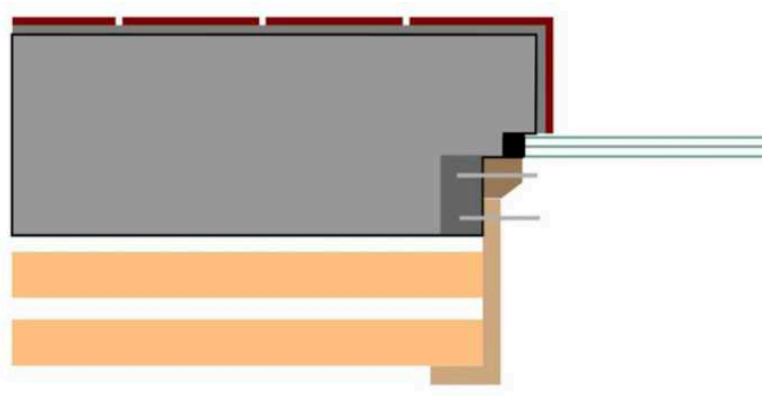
Triple glass standard window example (Ulla-B. Krämer; Arjan de Haan, 2020)
